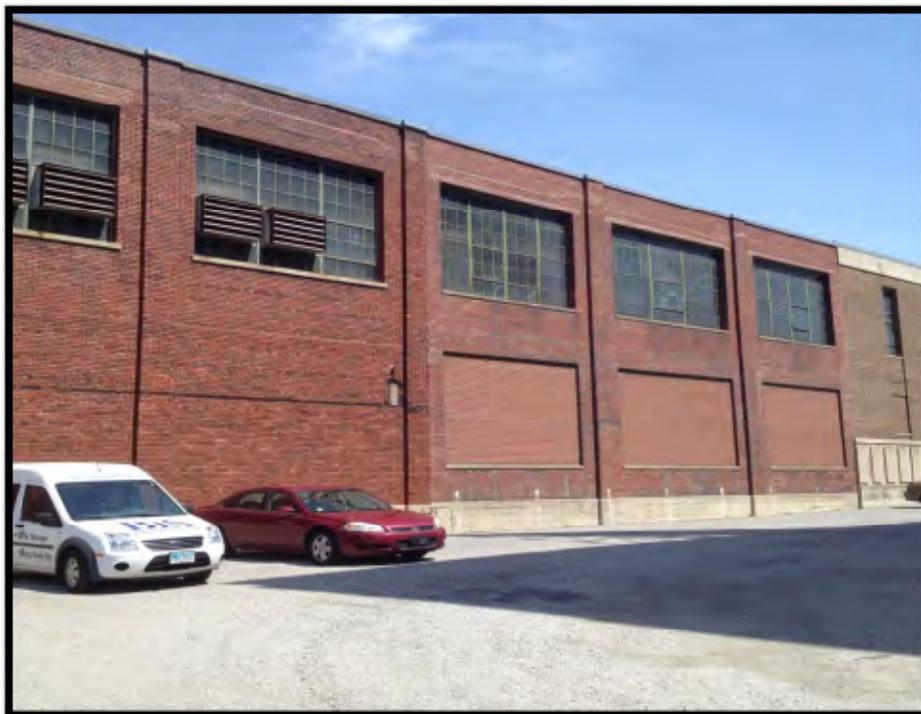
View of southern portion of building, looking northeast from Buck Street.
